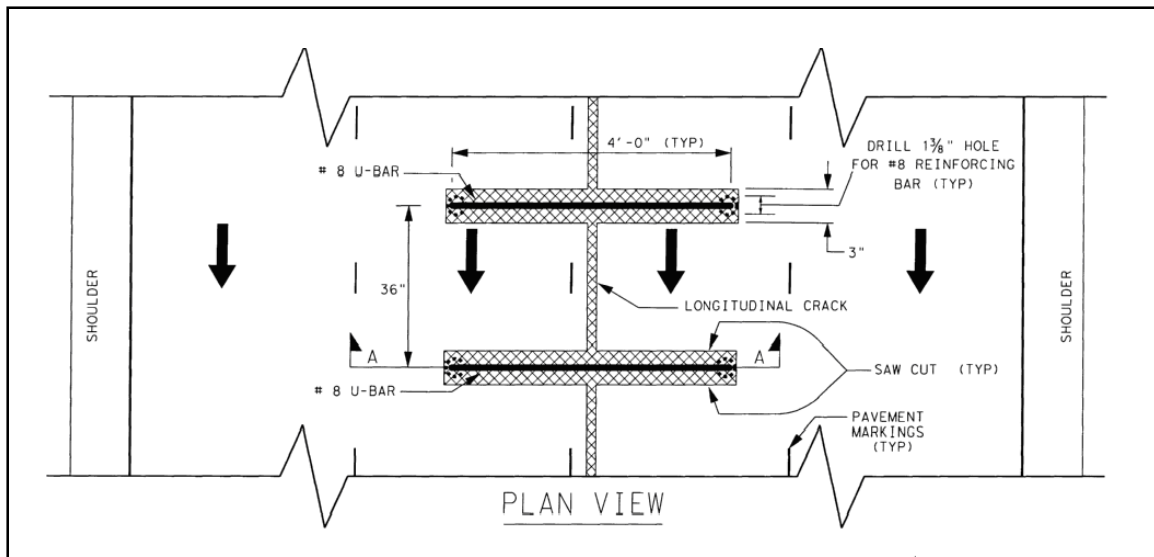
Plan View of Stapling Repair (TxDOT 2004c)
